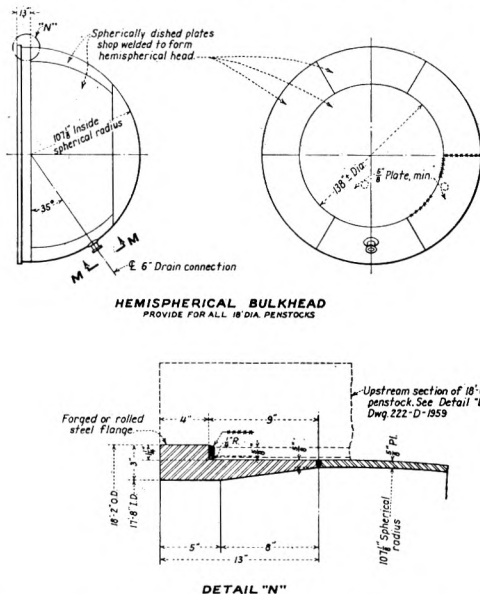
HEMISPHERICAL BULKHEAD FOR 18-FT PENSTOCKS
